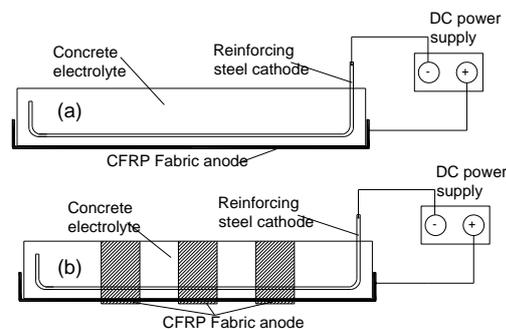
Schematic ICCP Application to corroded reinforced concrete beams
